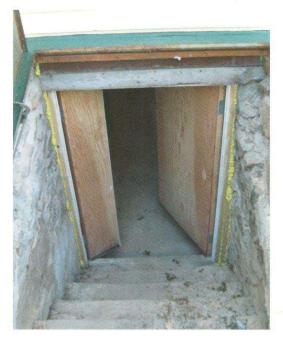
SITE BUILT INSULATED DOOR AT THE BOTTOM OF THE BASEMENT BULKHEAD.
